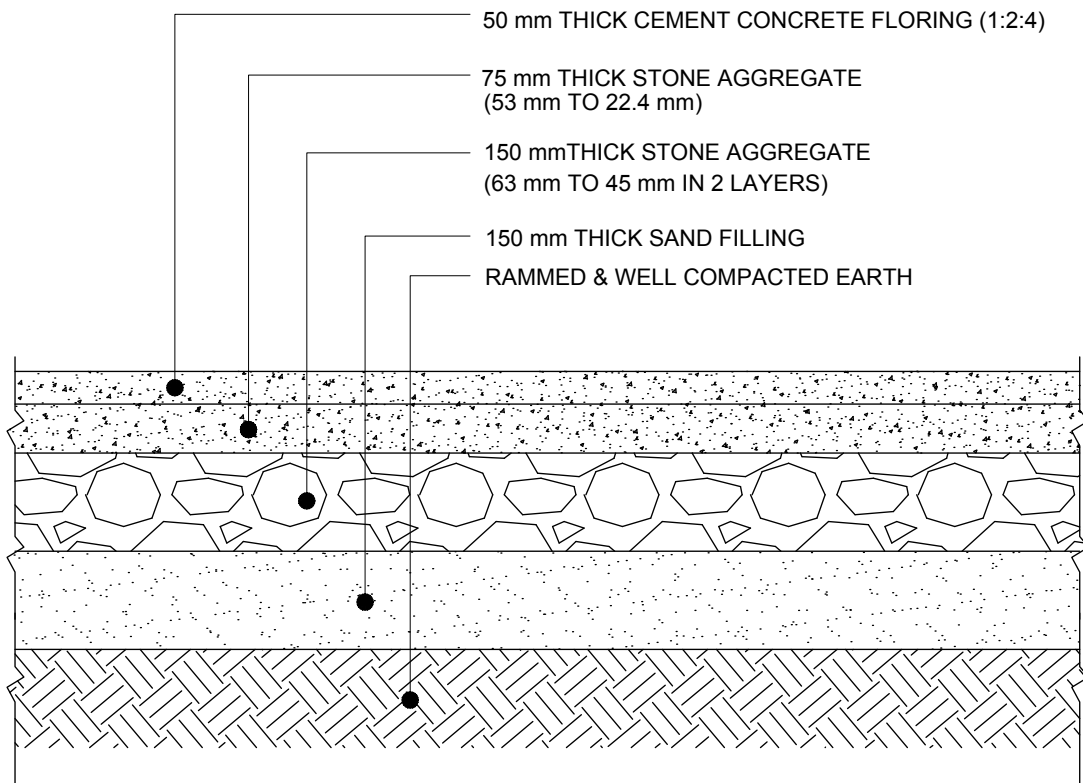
DETAILS OF FLOORING (MAIN GODOWN)
